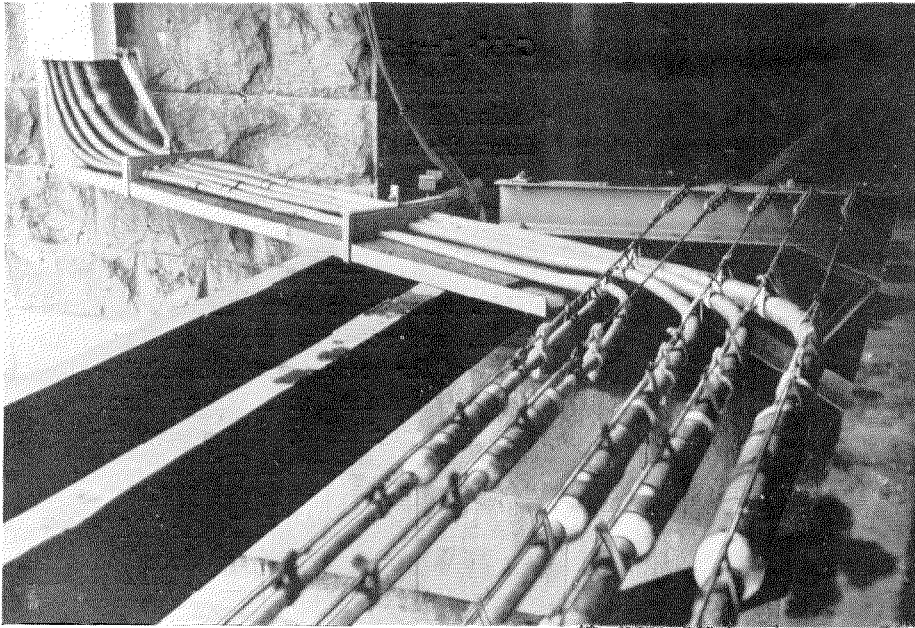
Forth Bridge — End of horizontal aerial run on G.I. strand on south viaduct and commencement of rise on south pier.
